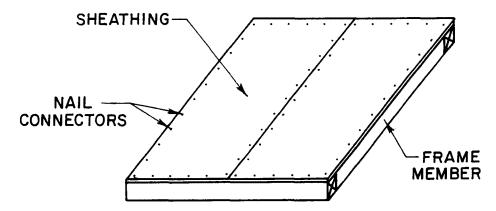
Typical two-panel nailed sheathing diaphragm.
